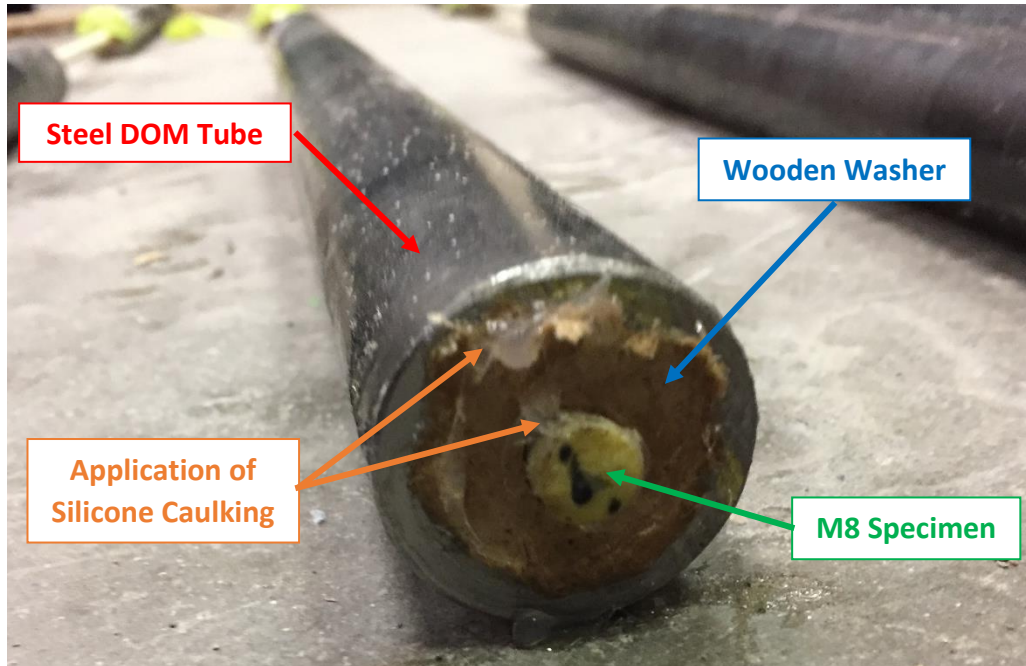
Cross-section of M8 GFRP Specimen Preparation Before Casting Expansive Grout
